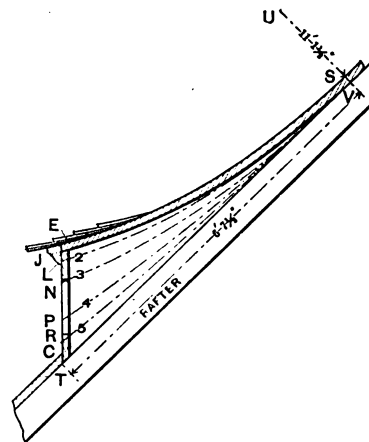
Vertical Cross Section through Window, showing Curved Roof and Ribs.
